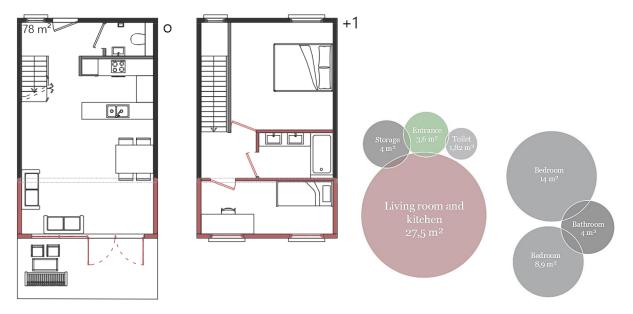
Floor plans and corresponding floor areas of the expandable house in the 'Children' scenario
